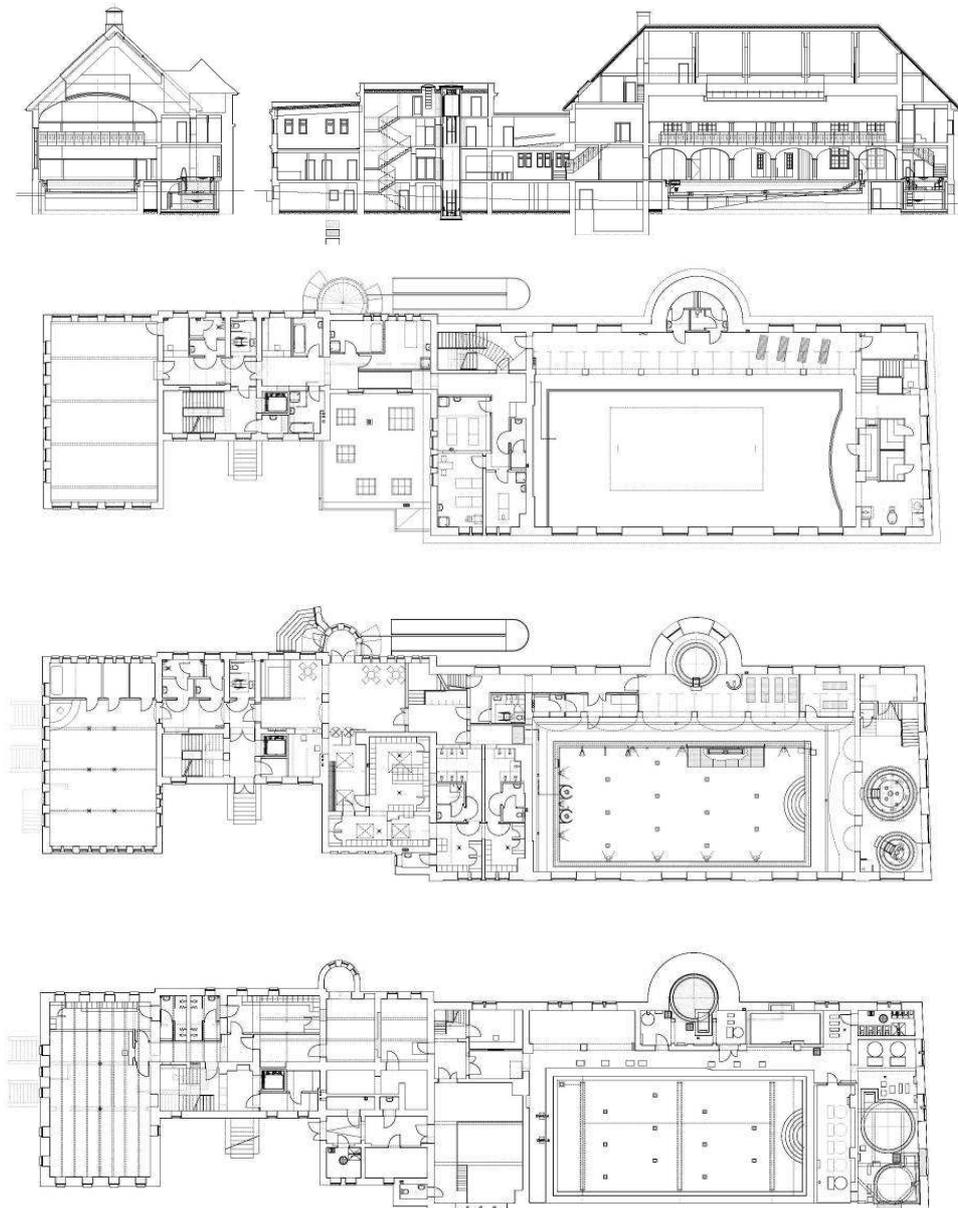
Plan of the basement, ground and first floors of the building, and cross-sections - version put into implementation (*based on remodelling construction project - from the author's archive*)
